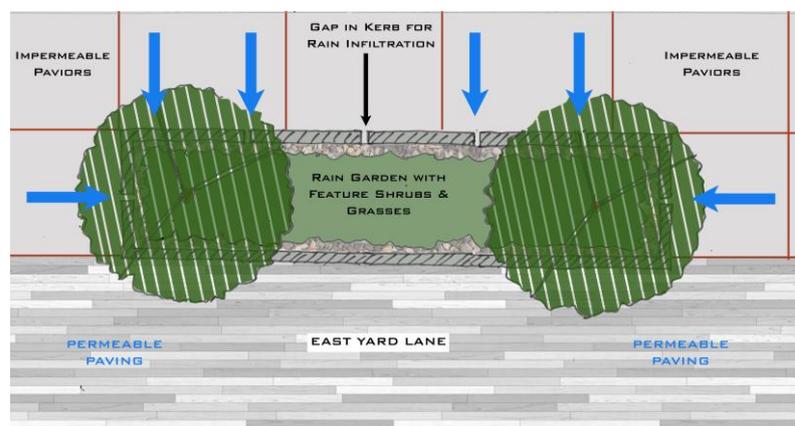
Plan of East Yard Lane demonstrating integration of Landscape and Drainage design (from BSM Landscape Design Report)
